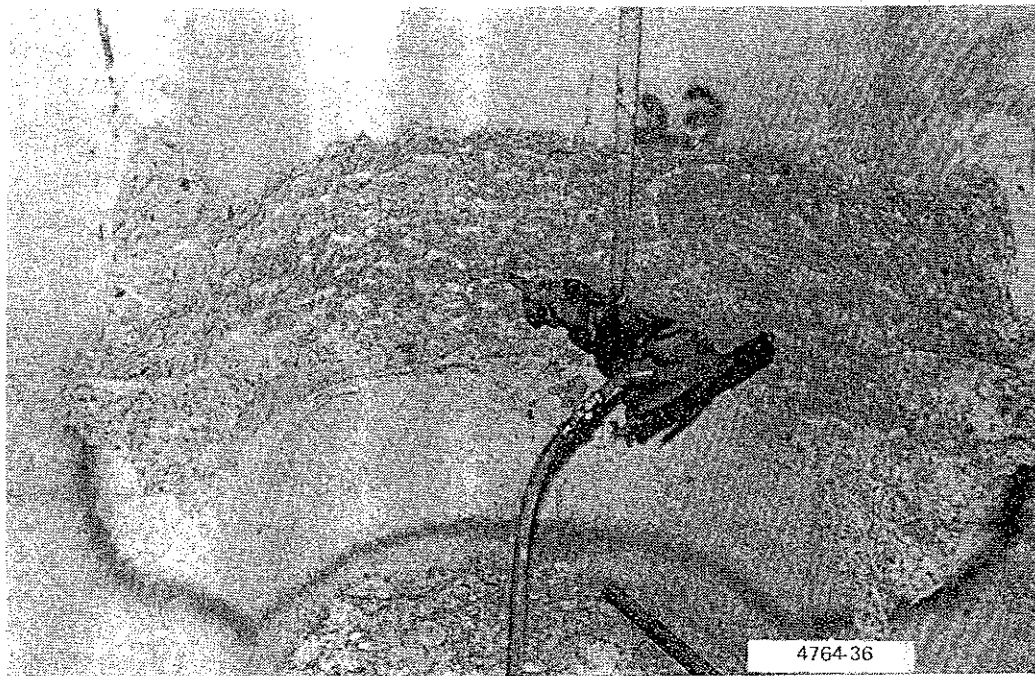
Excavating Concrete From Wall Surrounding Secondary Reactor Operating Position
